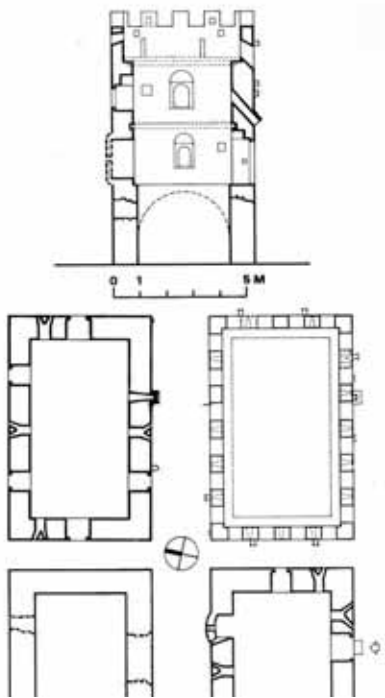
The tower of Mavrikos (1814), a notable of Malta. Below: plan of first and second level; center: plan of third level and flat roof; above: section. (Saitas, 2001)
